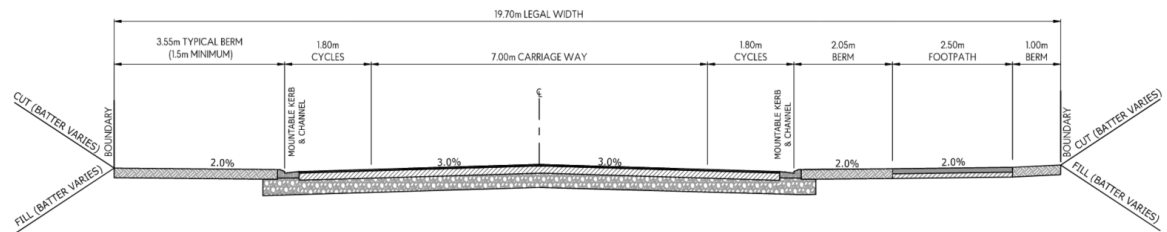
Typical Cross-Section (C) Collector - 19.7m with Cycleway
